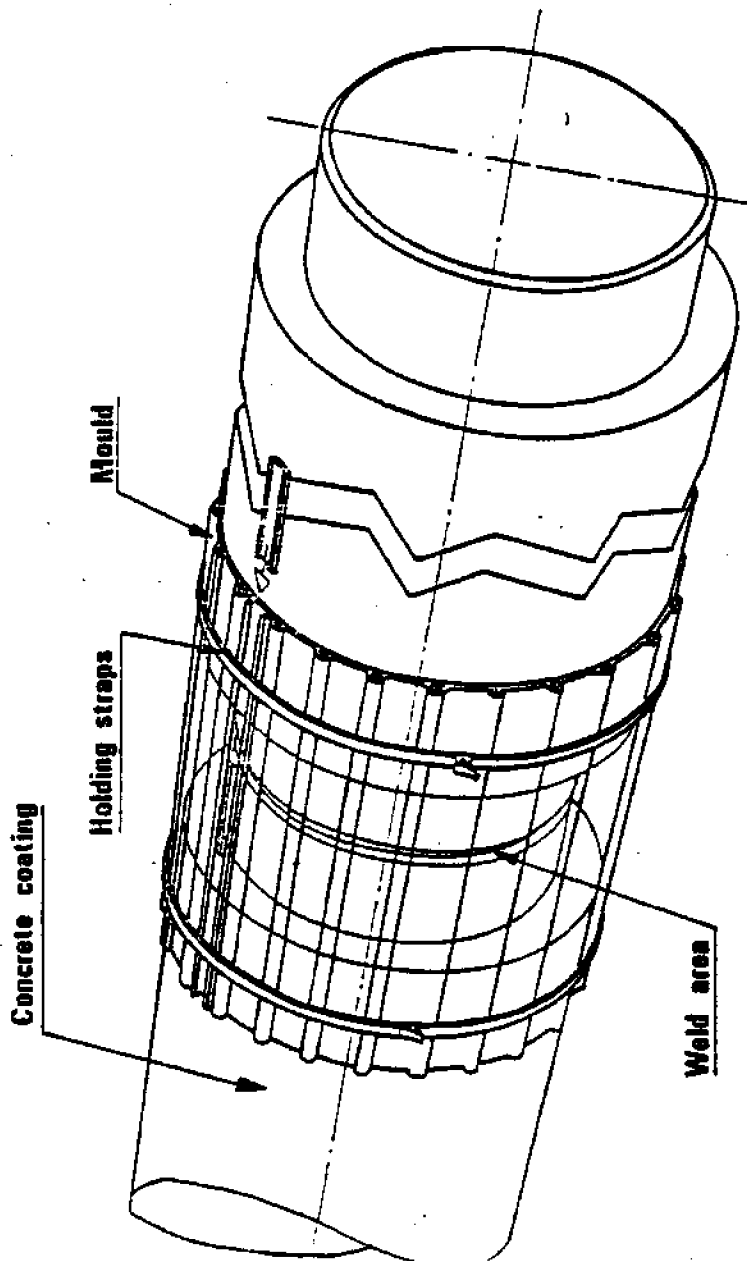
Magnesium Mould for Pipeline Field Joints
